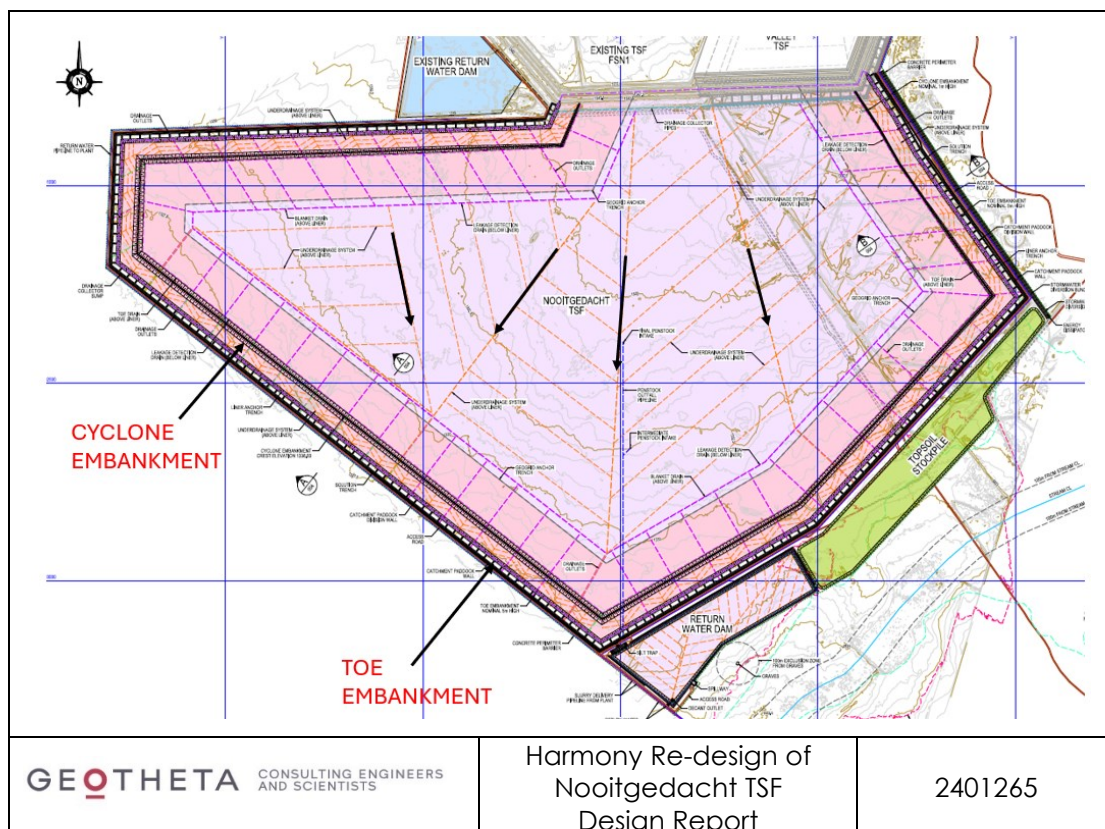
Underdrainage layout system flow direction (refer to Drawing No. 2401265-002)
